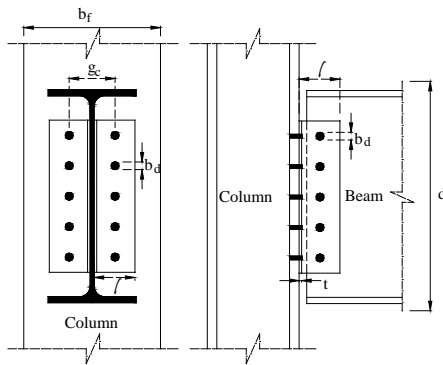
Configuration of Bolted/bolted double web angle connection test specimen
